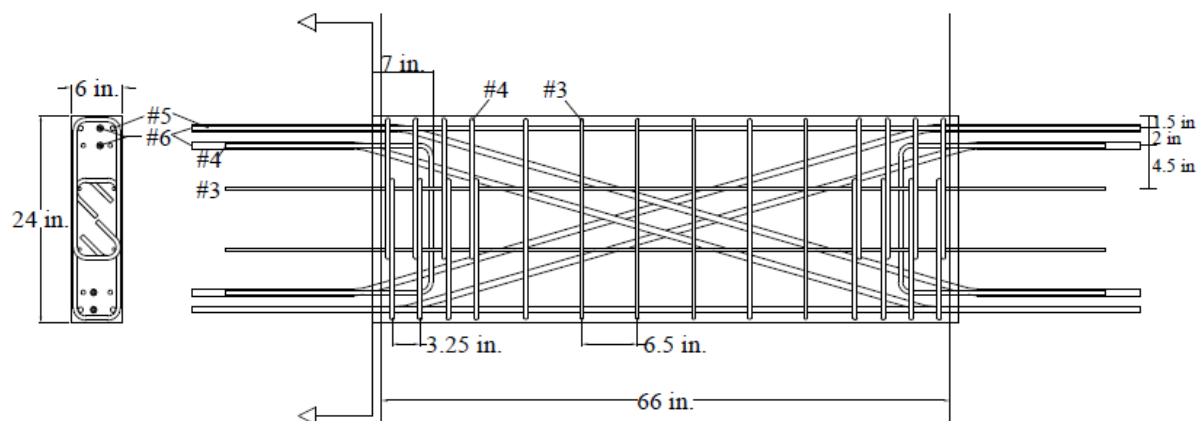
Reinforcement detailing for CB-2 (adapted from Setkit, 2012)
